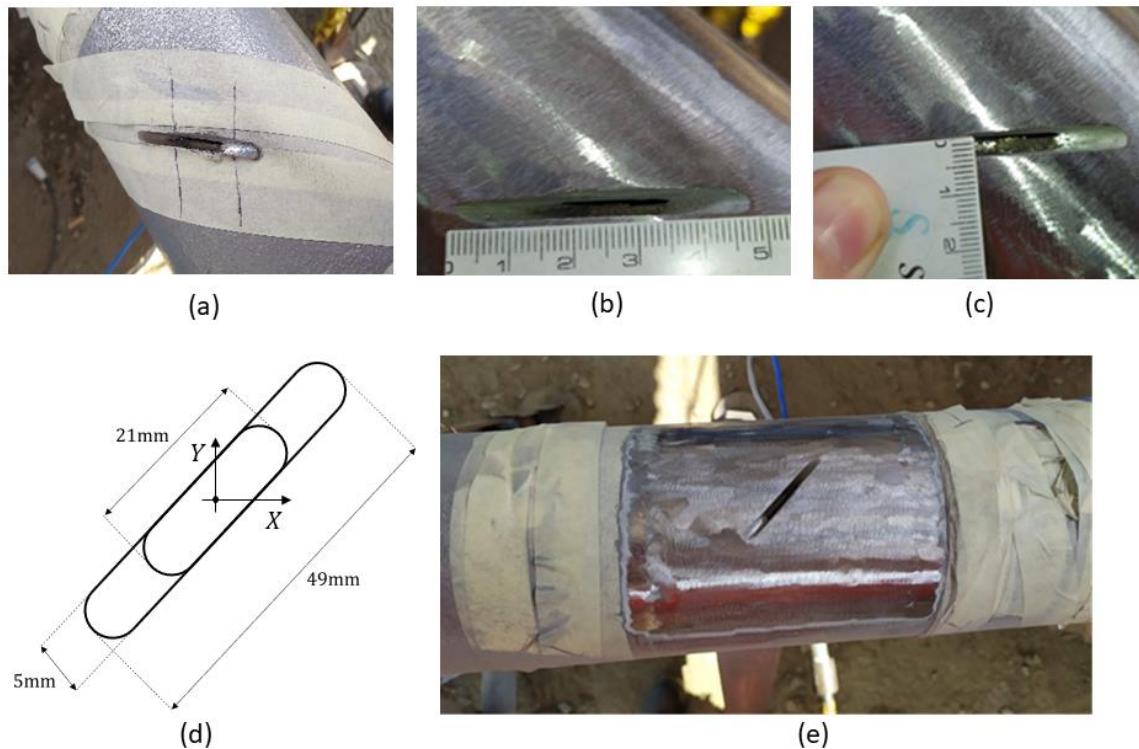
Crack-like, through-thickness cut, damage: (a) overall view; (b) length in detail; (c) crack opening in detail; (d) crack schematic; and (e) region prepared to receive the repair patch.
